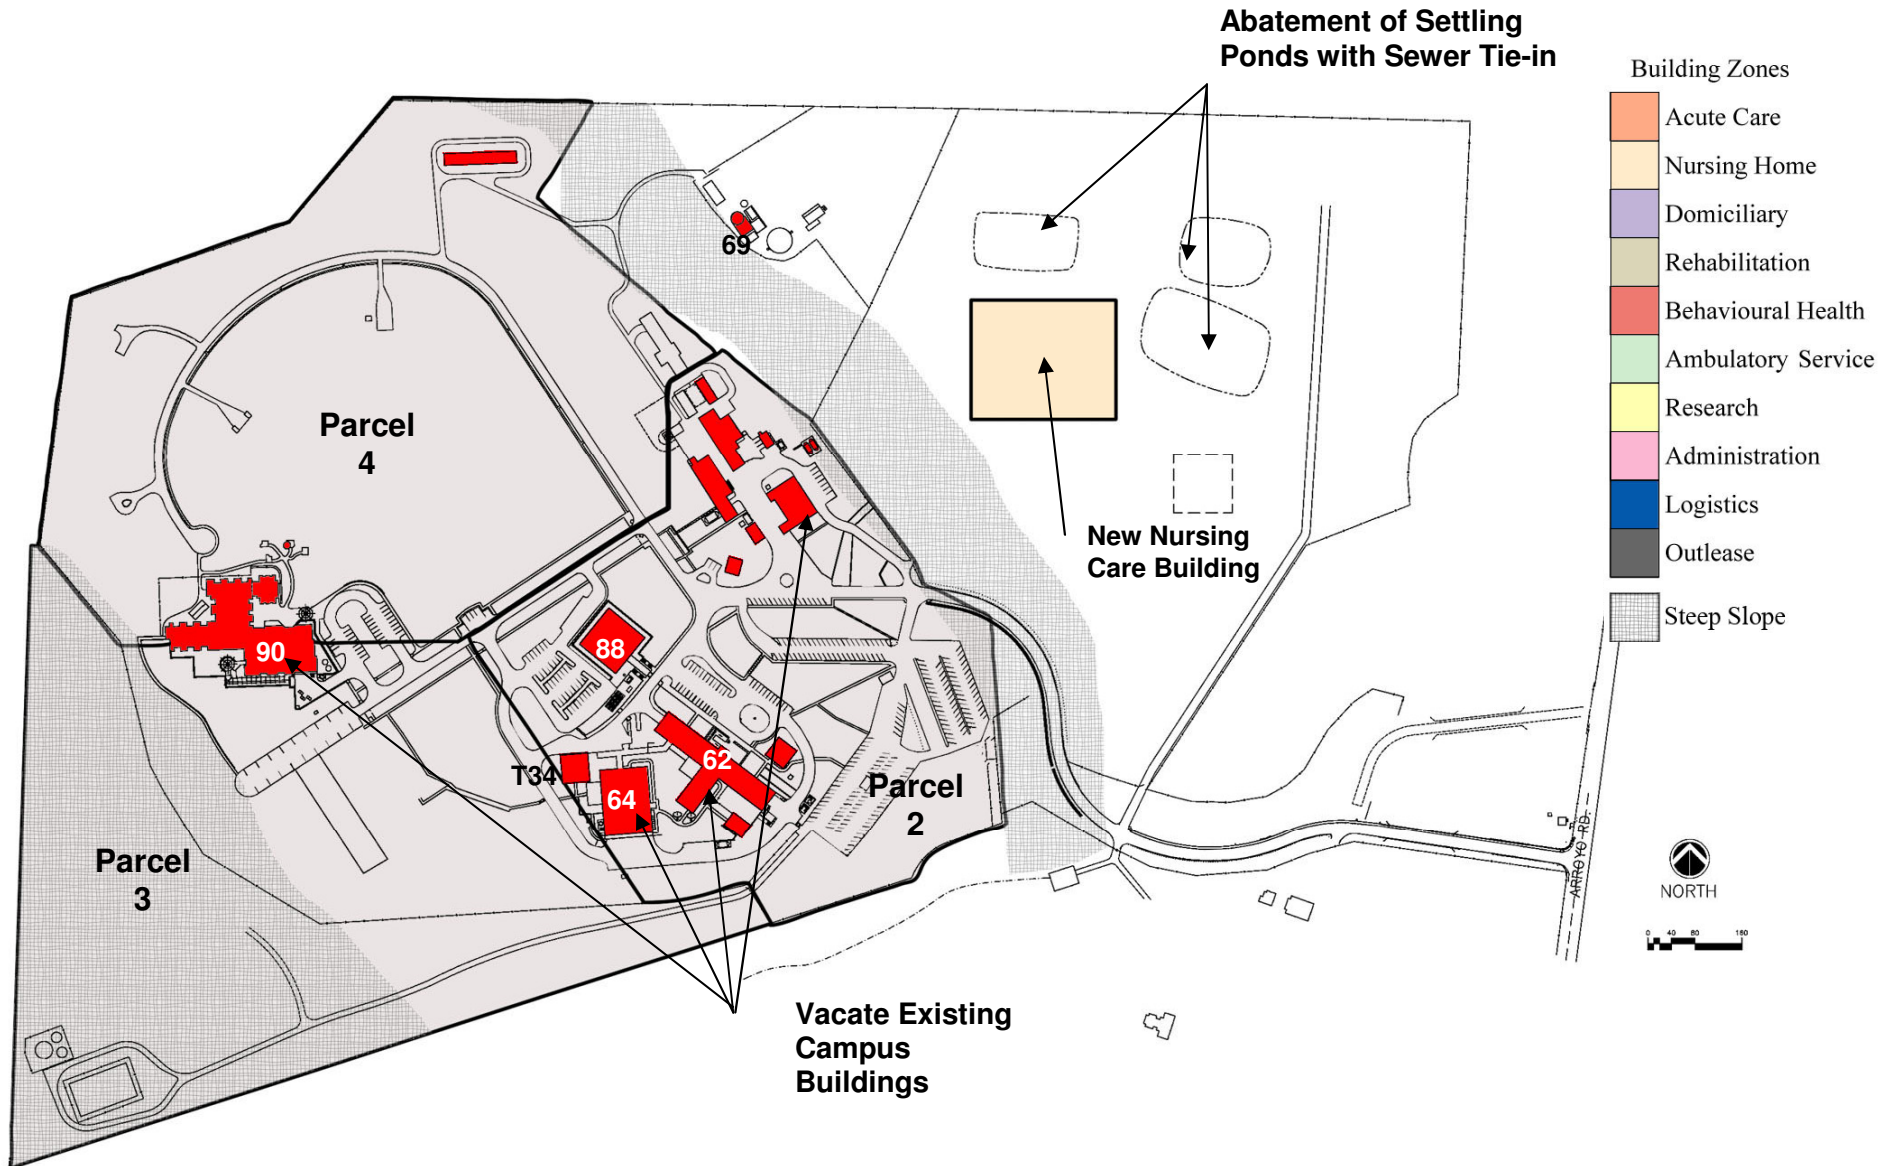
Proposed Site Plan - BPO 3 (New NHCU On-Site In Parcel 1 (Lower Campus))
